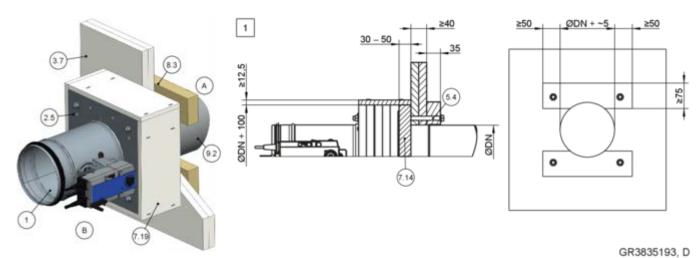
Dry mortarless installation into a shaft wall with metal support structure, with installation kit WA2
